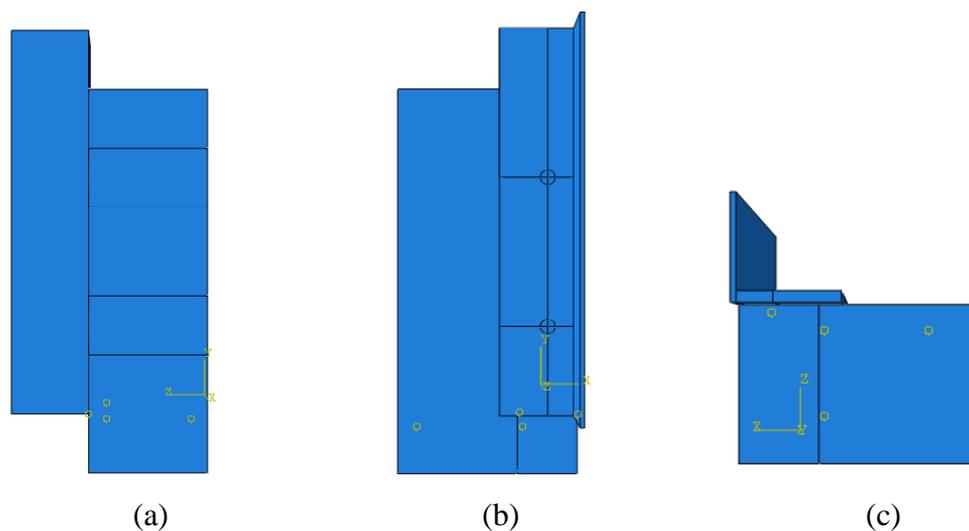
Assemble of model (a) side view (b) Front view (c) Top view
